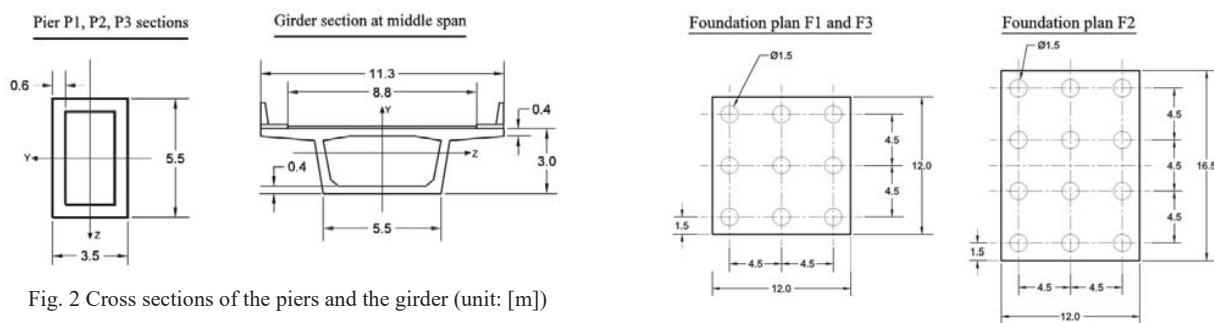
Cross sections of the piers and the girder (unit: [m])
